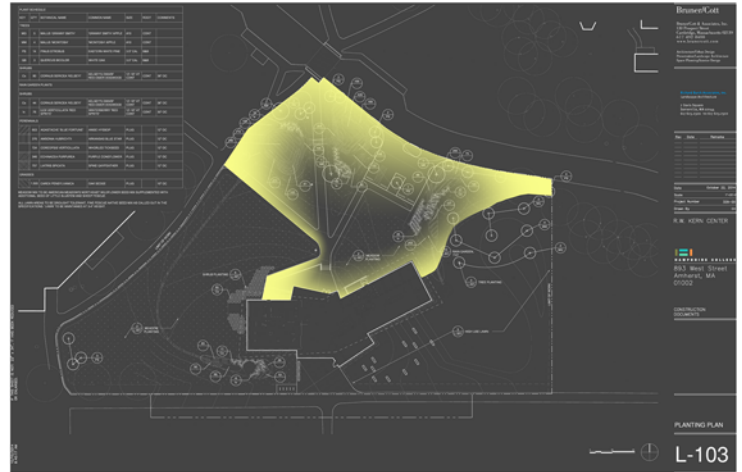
Meadow Planting | Rain Garden—Site Plan
